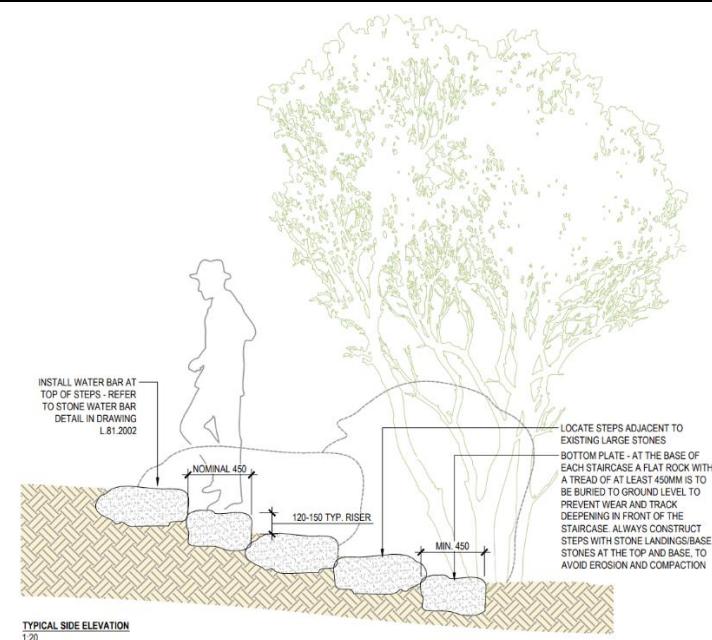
Typical design for stone steps. (Source: Hansen for Parks Victoria, Kit of Parts: Track and Trail Elevated Walkway – Option 1, Drawing No. L.81.2002 T3, 05/08/2025)
